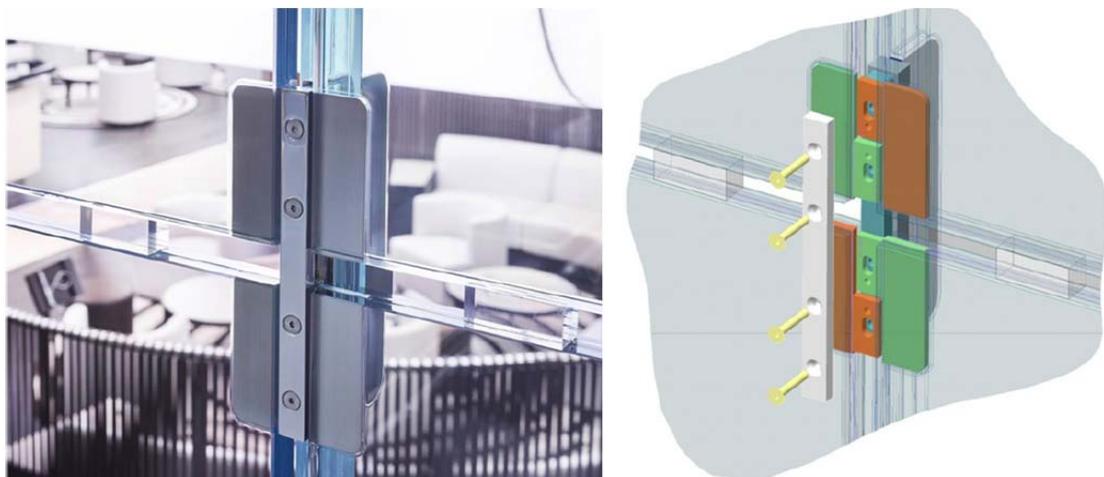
Connection detail of glass fin and façade (Kessnel-Henneberg 2016)
